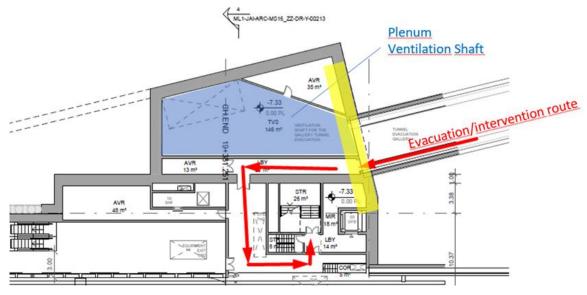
Parallel tunnel connection to ventilation shaft and evacuation/ventilation route through station
